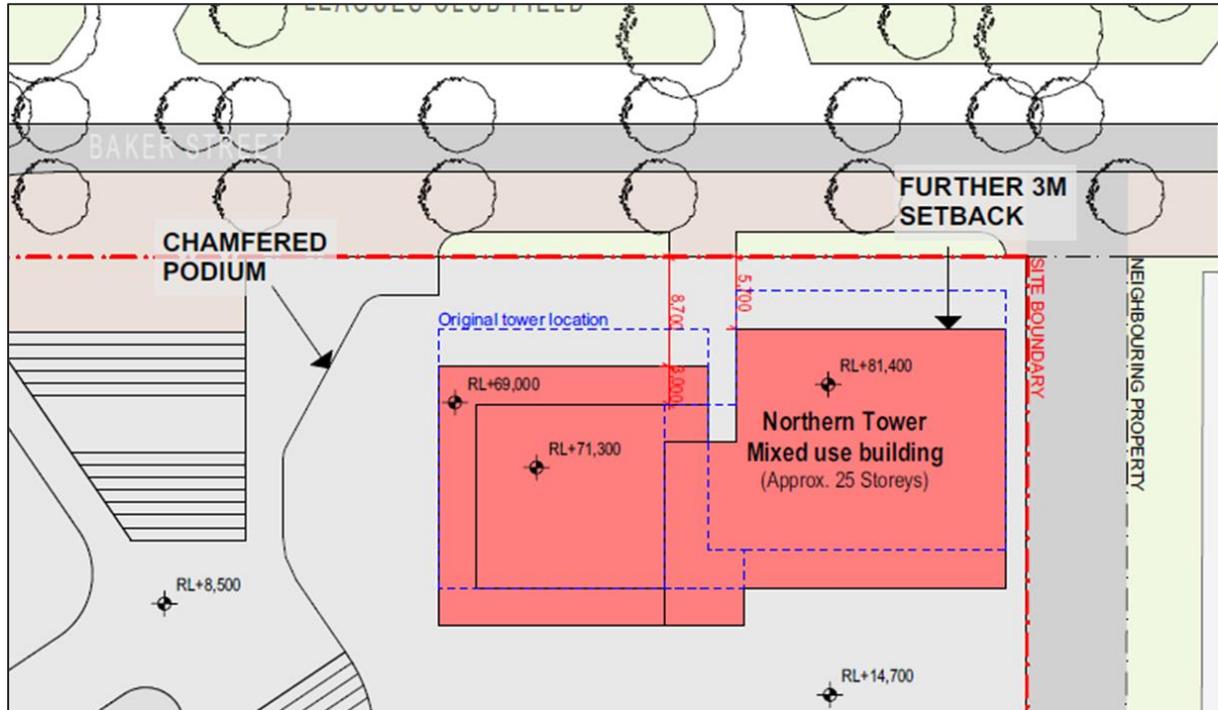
| Amended Northern Tower setbacks (Source: Applicant's RRFI)
